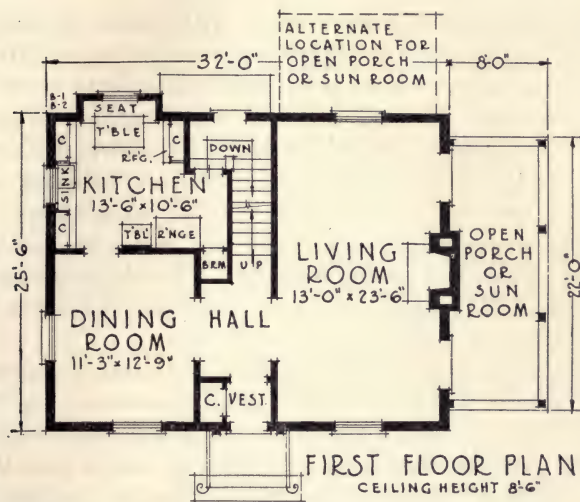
First-floor plan. Ceiling height, 8 feet 6 inches
